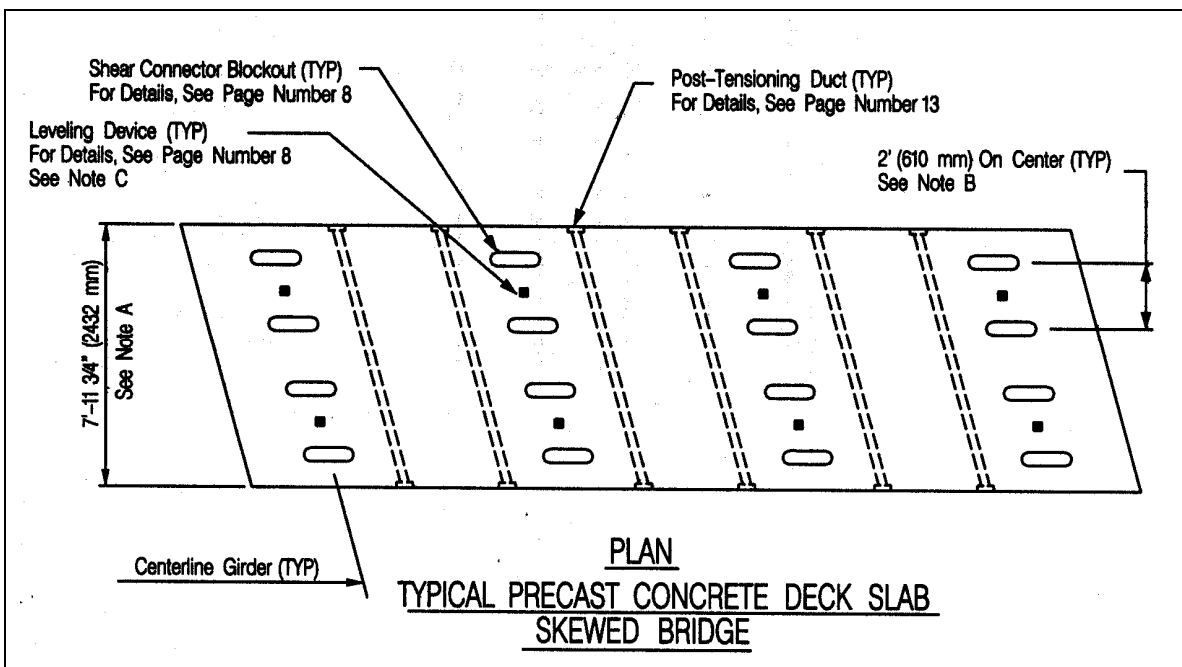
Typical precast concrete deck slab for skewed bridges plan (PCINER, 2002)
